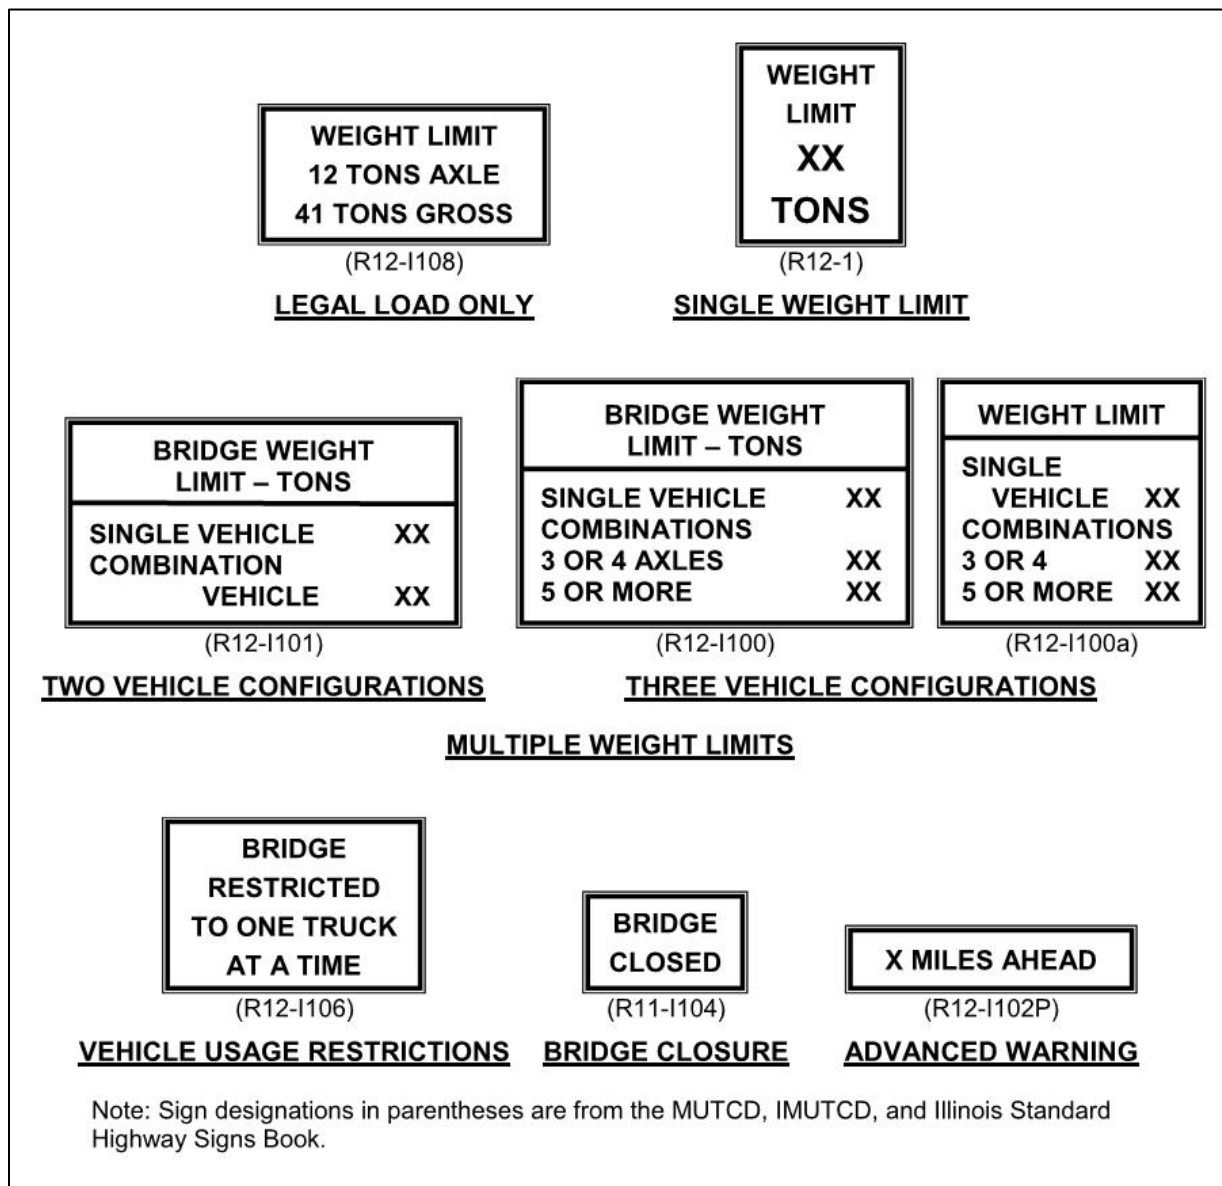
TYPICAL LOAD POSTING SIGNS
